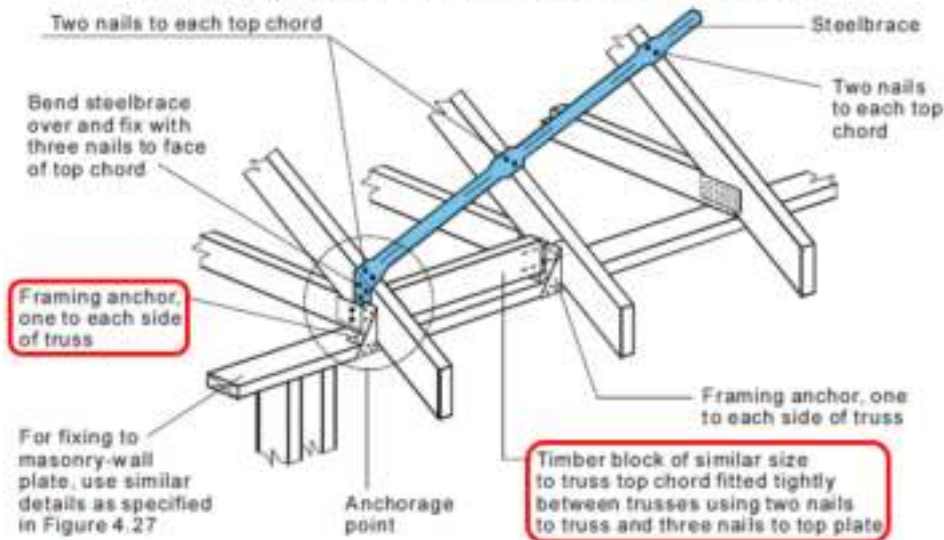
END FIXING DETAILS AT HEEL—TO TOP PLATE (ALTERNATIVE)
